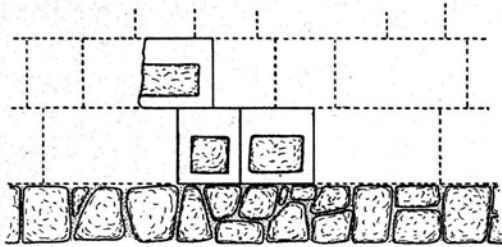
ELEVATION OF PART OF WEST WALL OF PALACE
